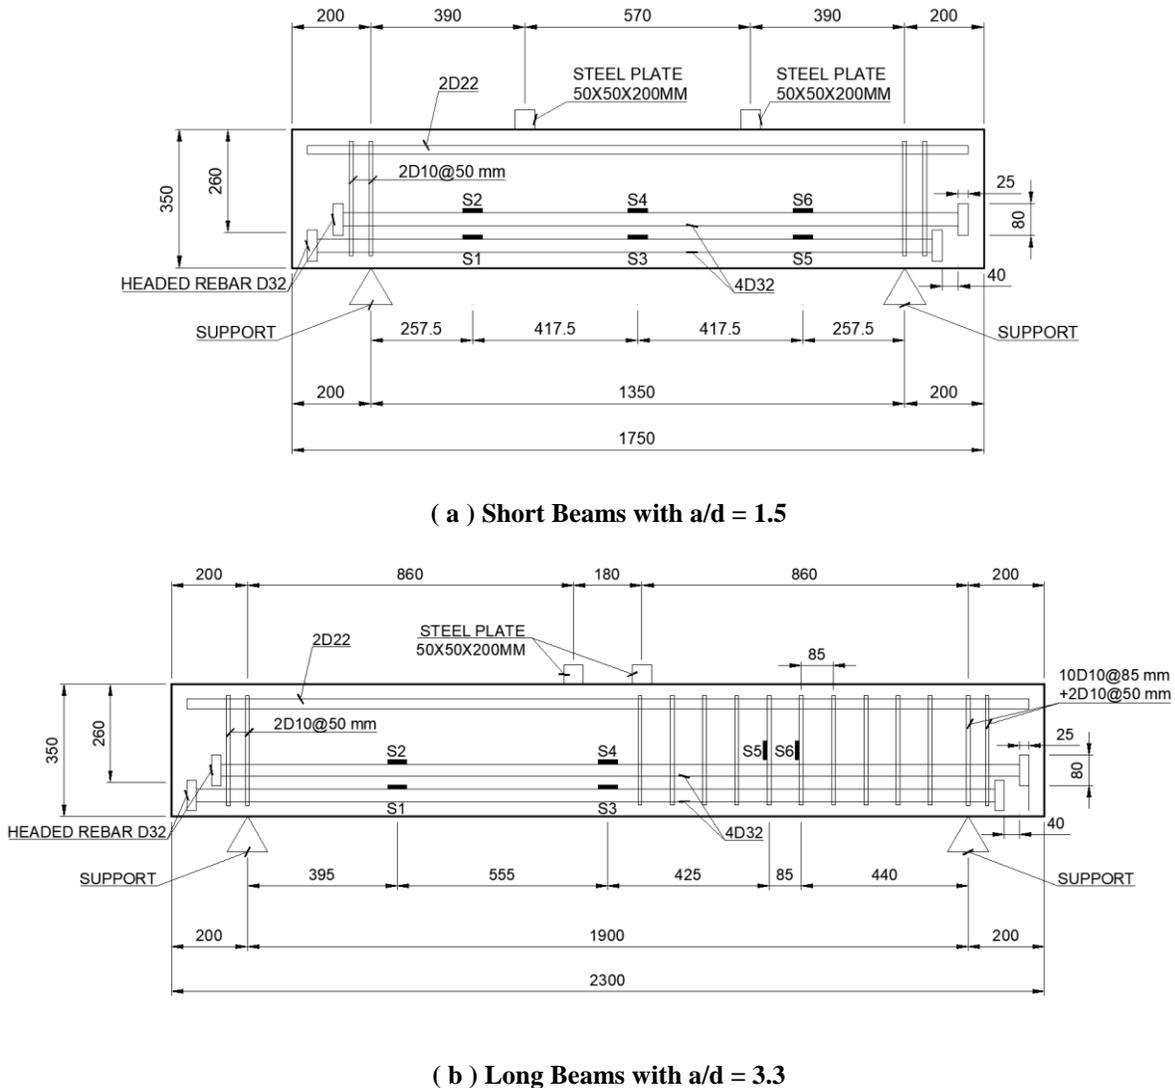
Reinforcement Details of Short and Long Beams (units in mm; 1 inch=25.4 mm)
